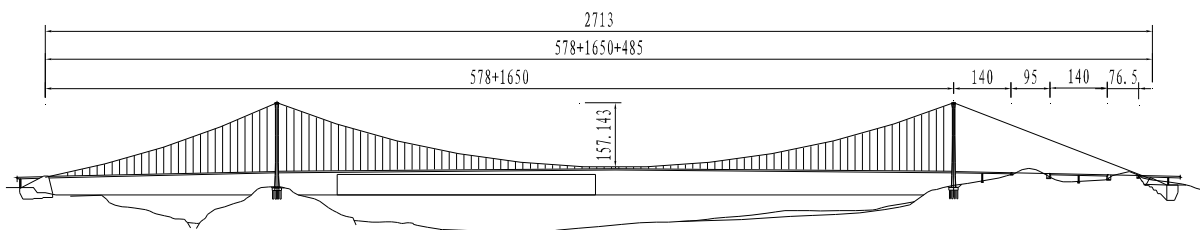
Elevation of Zhejiang Xihoumen Bridge (Unit: m)
